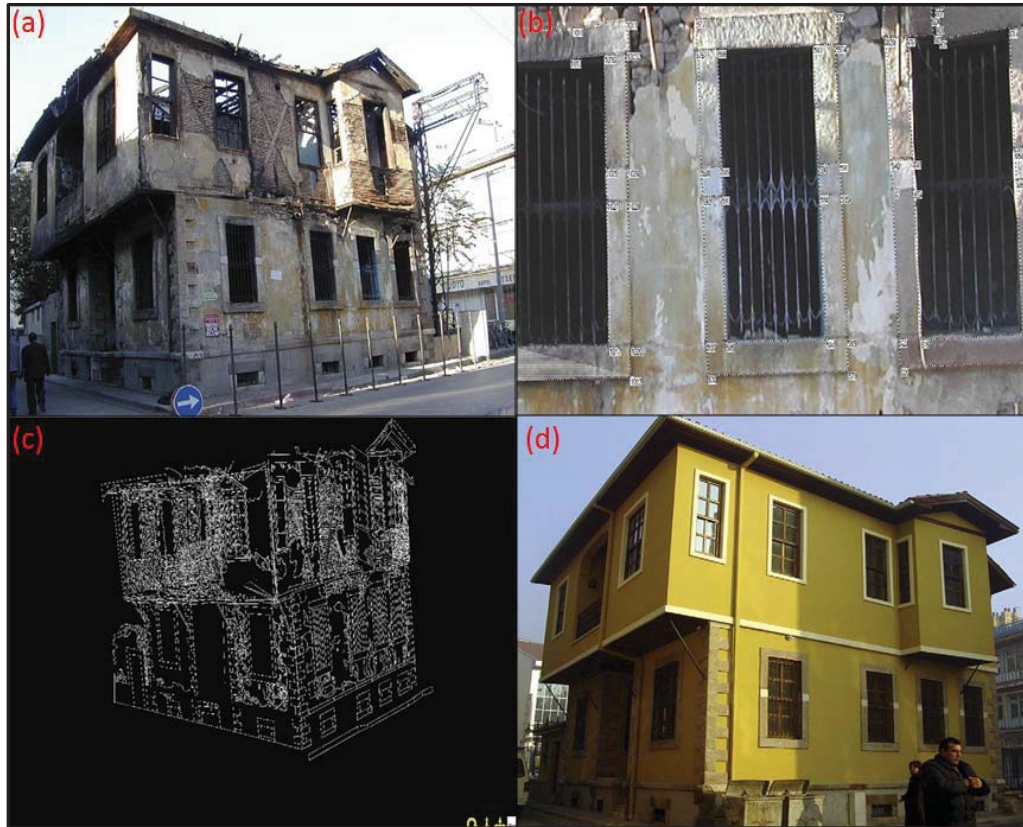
Reconstruction of damaged buildings using photogrammetry method [42]: (a) the situation of the building after fire, (b) control points on photograph, (c) 3D model of building solved with photogrammetry, (d) the reconstructed situation of the building.
